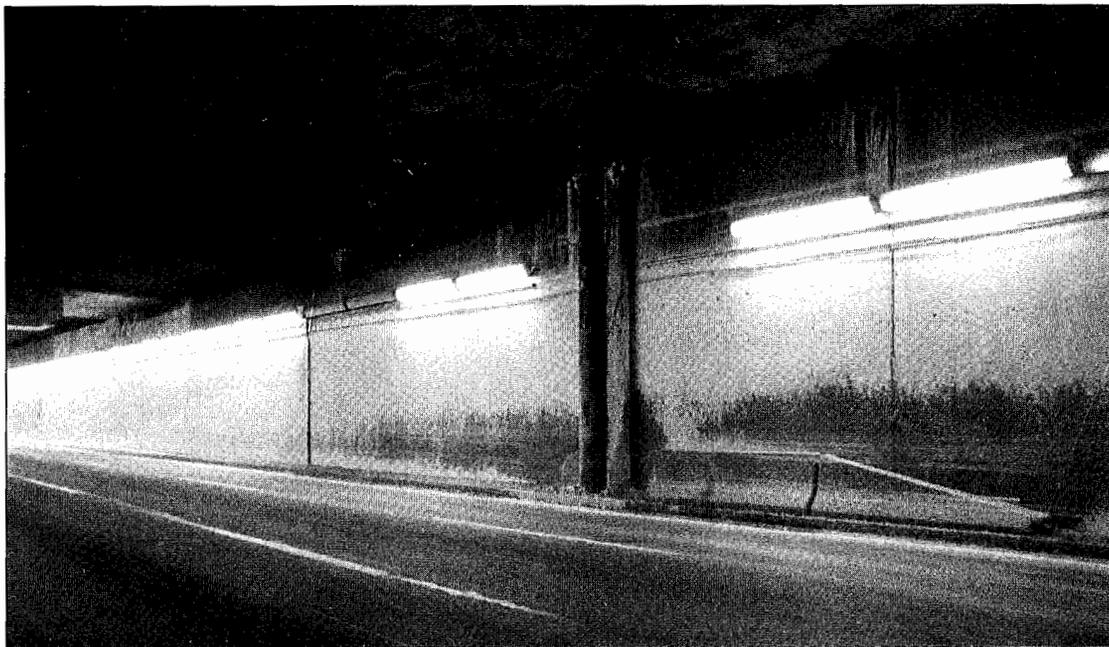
A view of Commercial Block C (Prudential Plaza level) from which drilled piles were installed.
